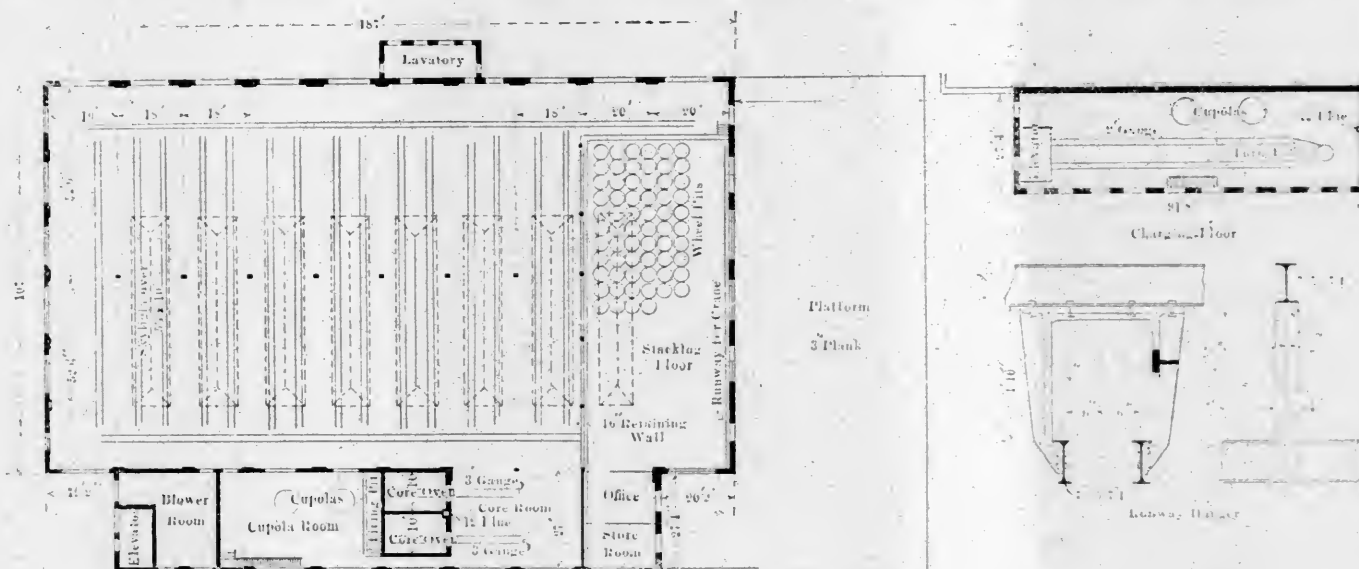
FLOOR PLAN OF WHEEL FOUNDRY.
